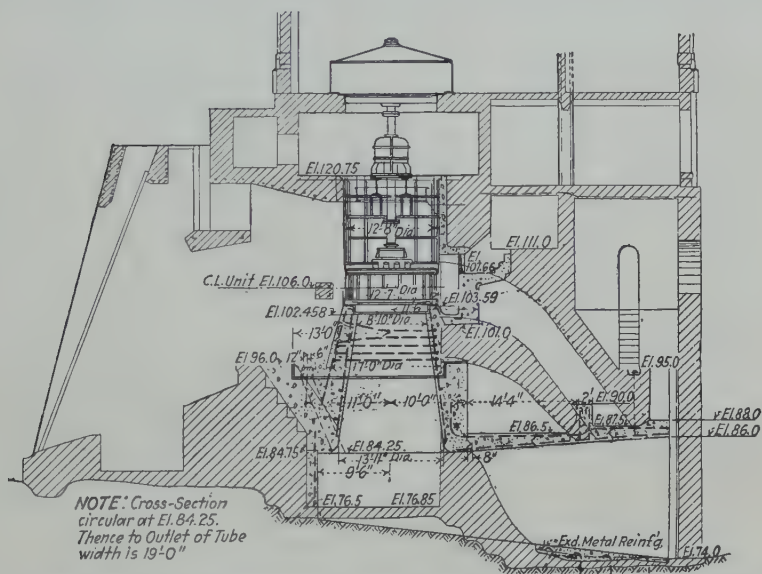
Reconstruction wheel units at Vernon plant—details of arrangement. (Courtesy of New England Power Company.)
